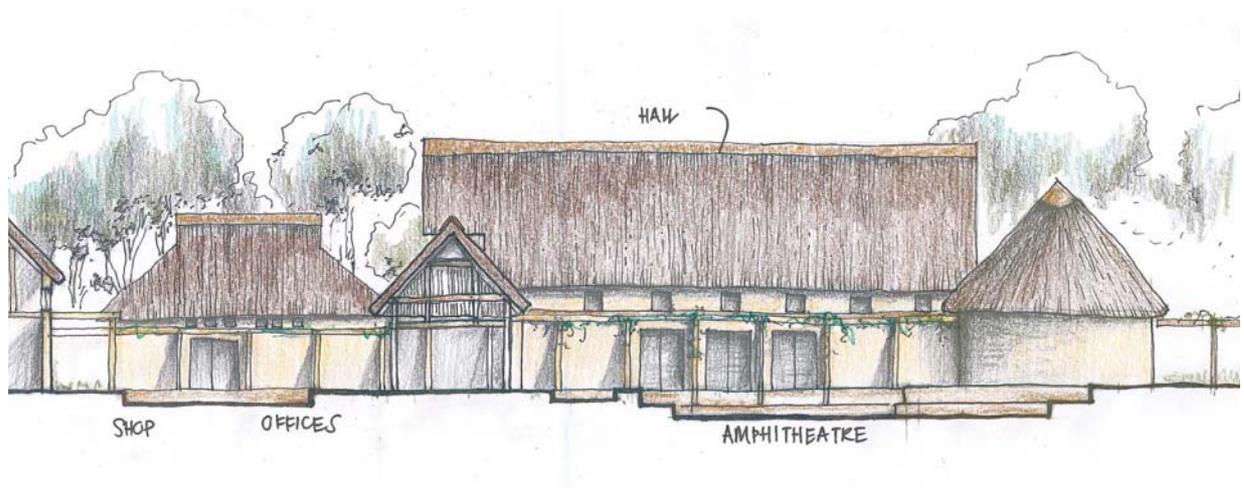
Moya weKhaya: Section elevation, design aesthetic
